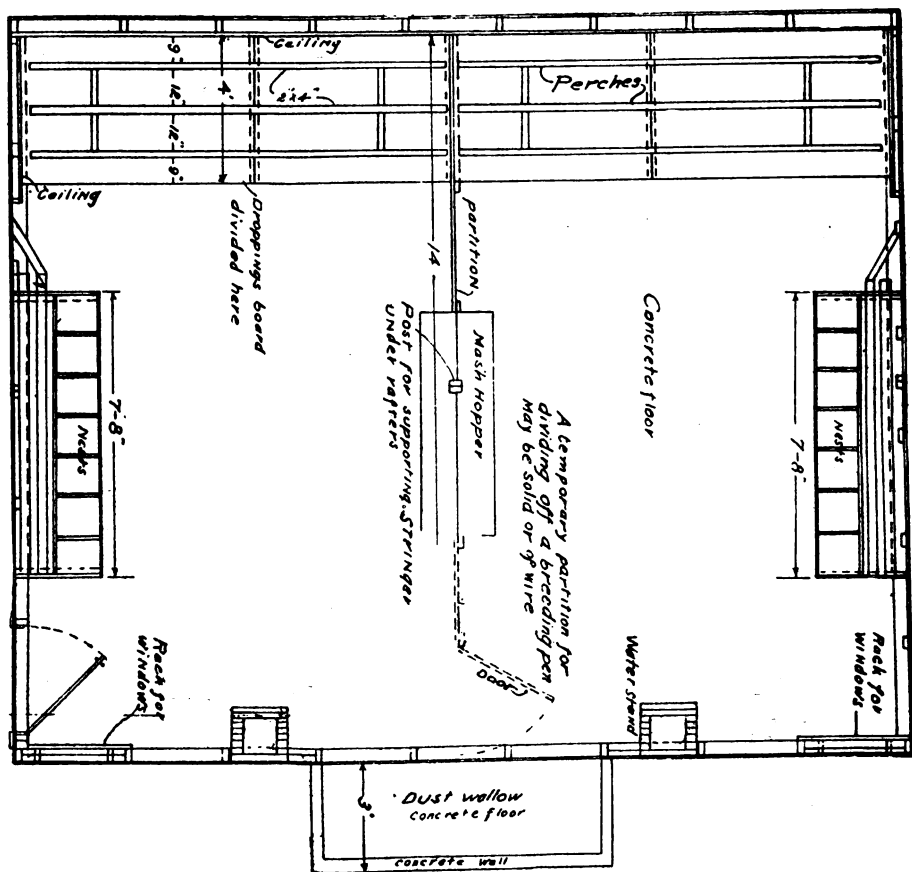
A.—Floor plan of the Cornell House, 12 ft. sections.
